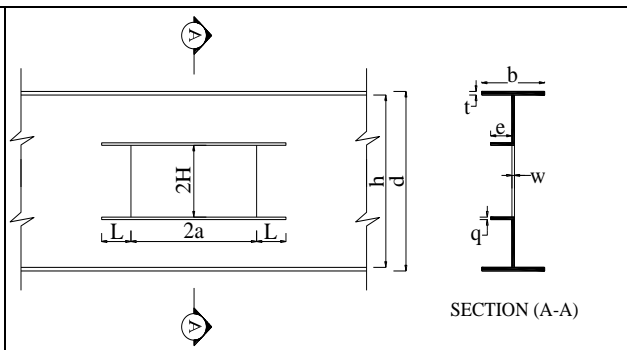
Detail of beams used in verification by Lupien and Redwood [3].
